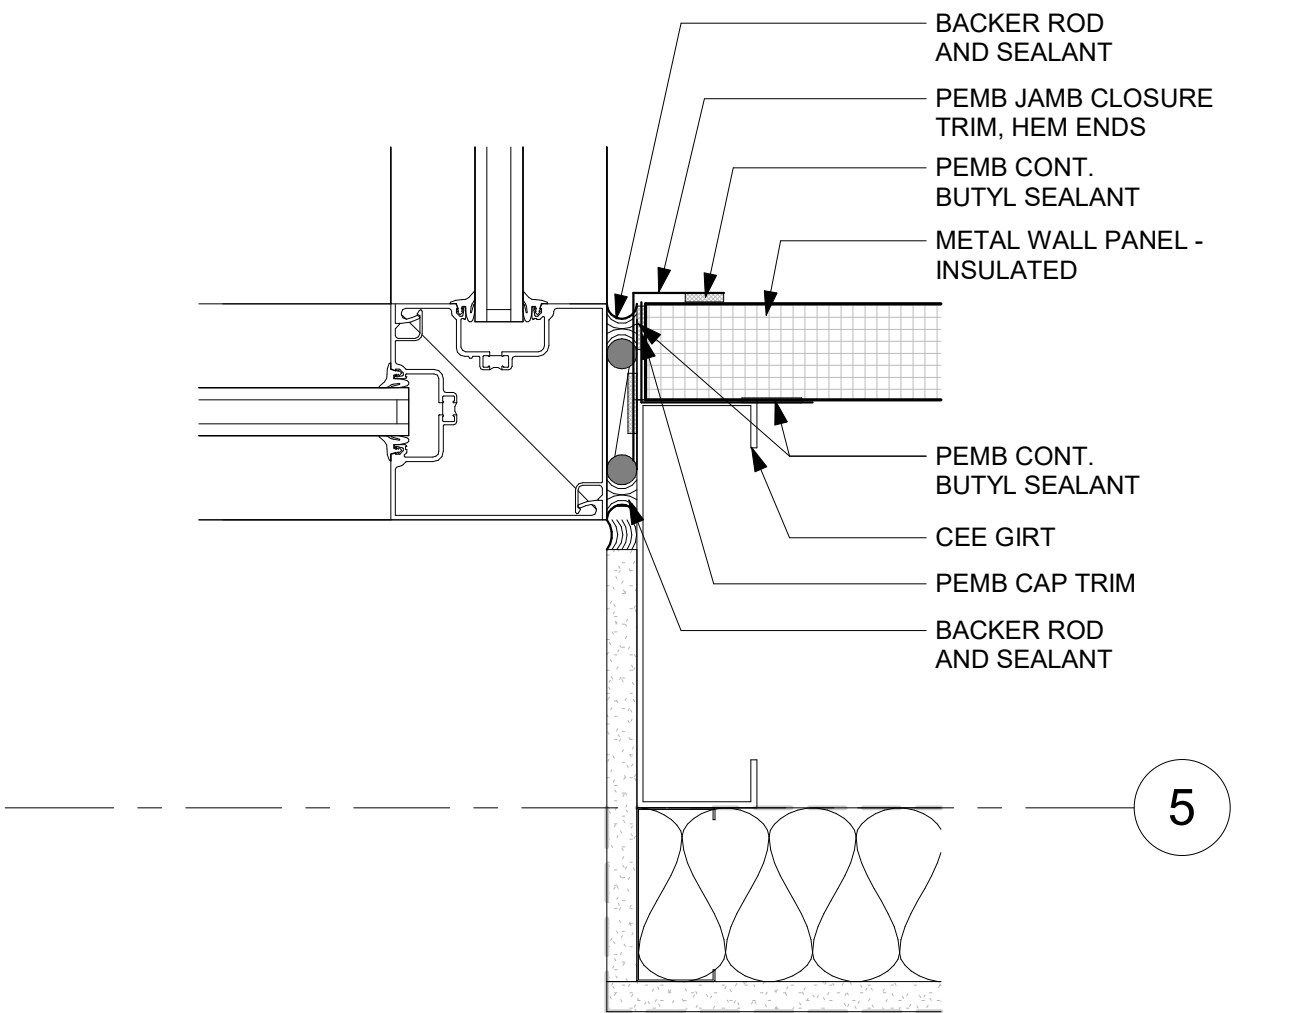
DETAIL - STOREFRONT SILL 2ND FLOOR 8
